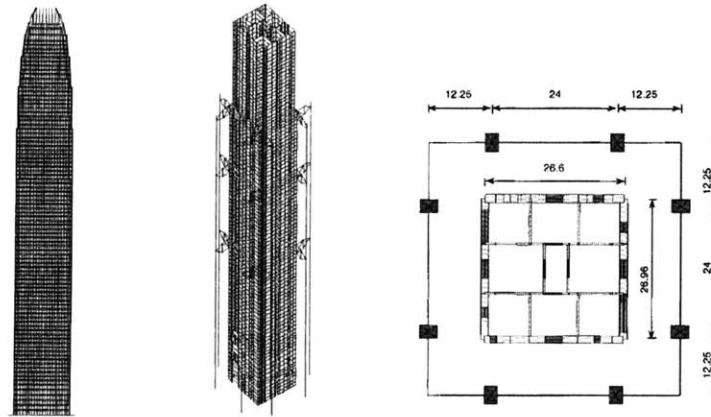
Front, side, and plan view of the 88-story tower in Hong Kong
